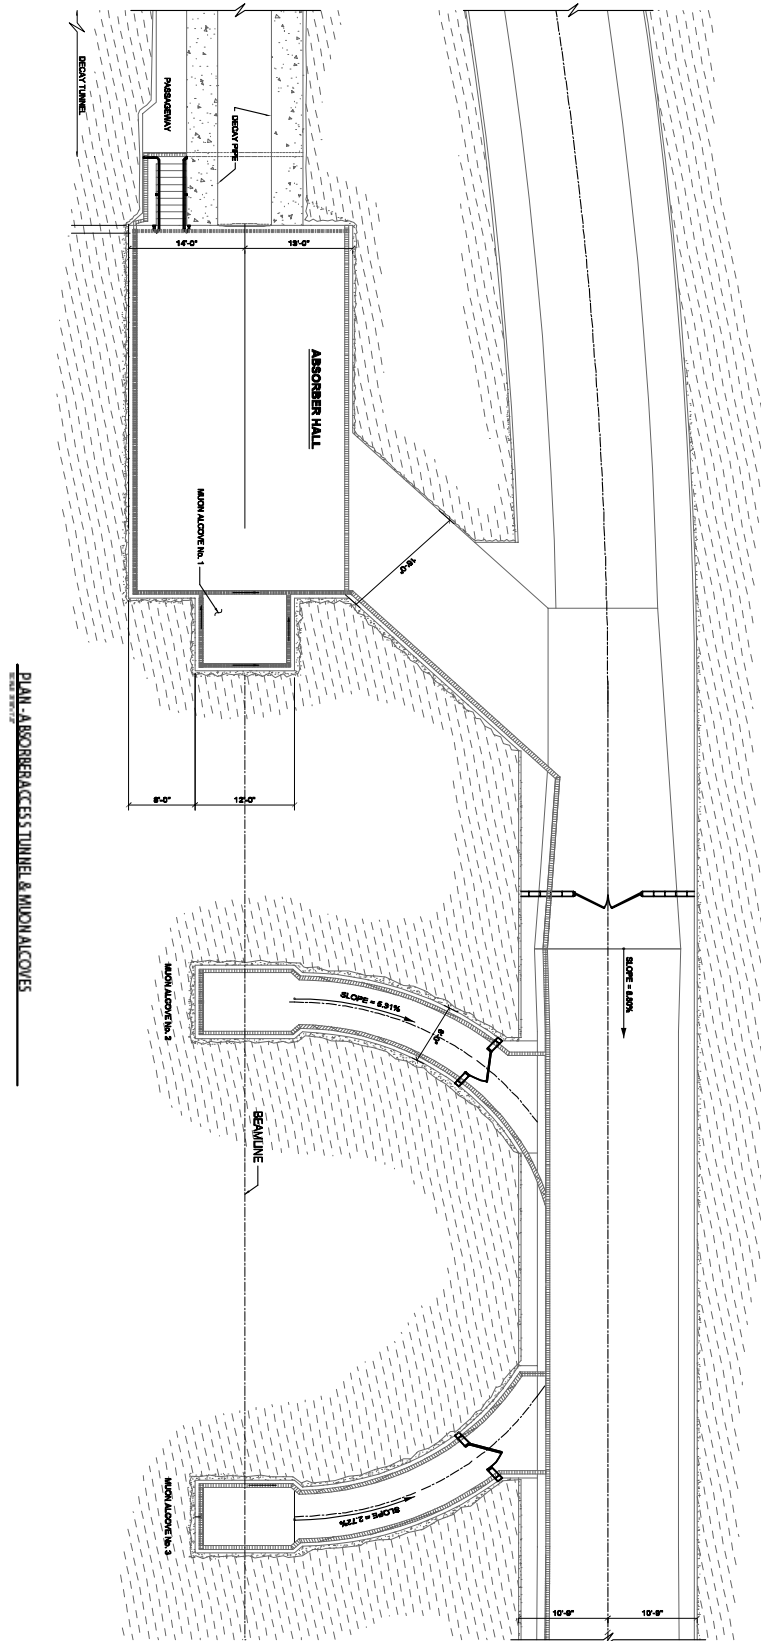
Absorber cavern, muon alcoves and access tunnel
